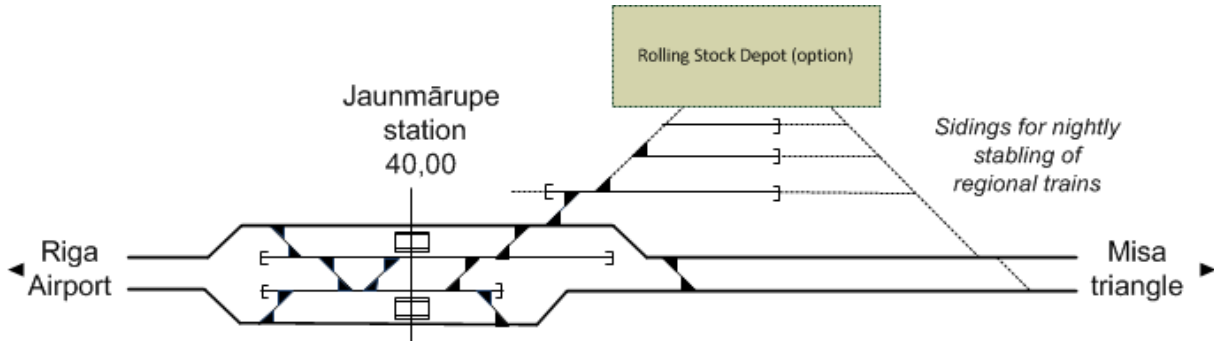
Jaunmārupe station – required changes of track layout for terminating trains and nightly stabling
